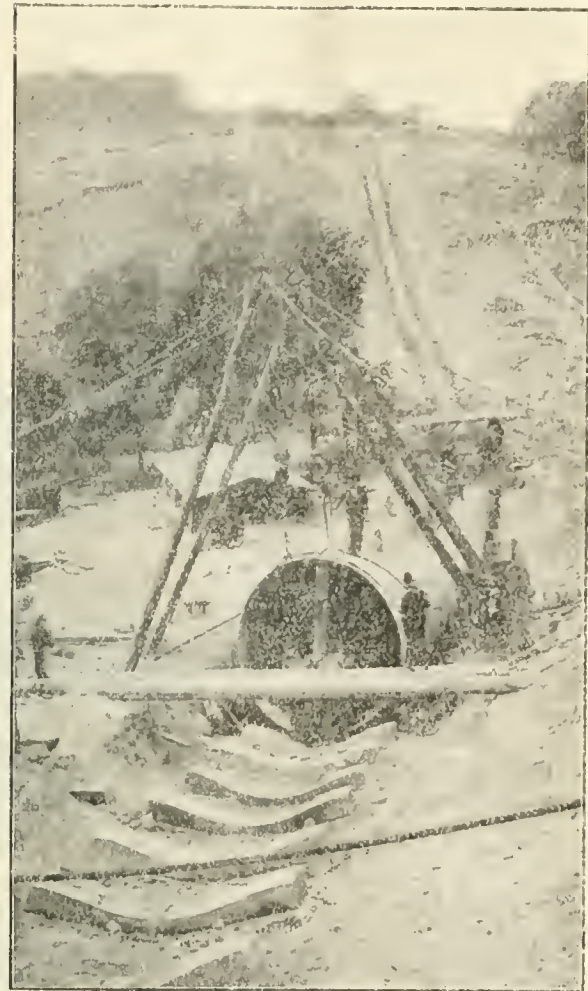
HUNTER'S BROOK STEEL PIPE SYPHON: ERECTING STEEL PIPE ON CONCRETE CRADLES PREVIOUSLY PLACED. (Pipe will be embedded in concrete.)
